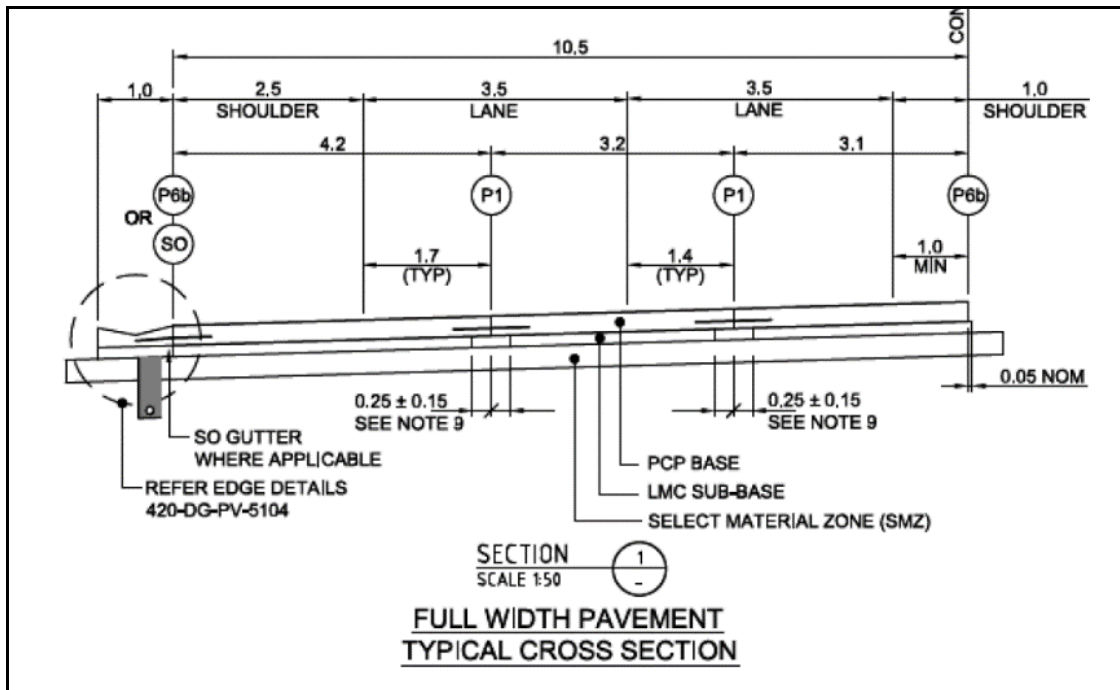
Full width paving showing longitudinal joints and linemarking locations
